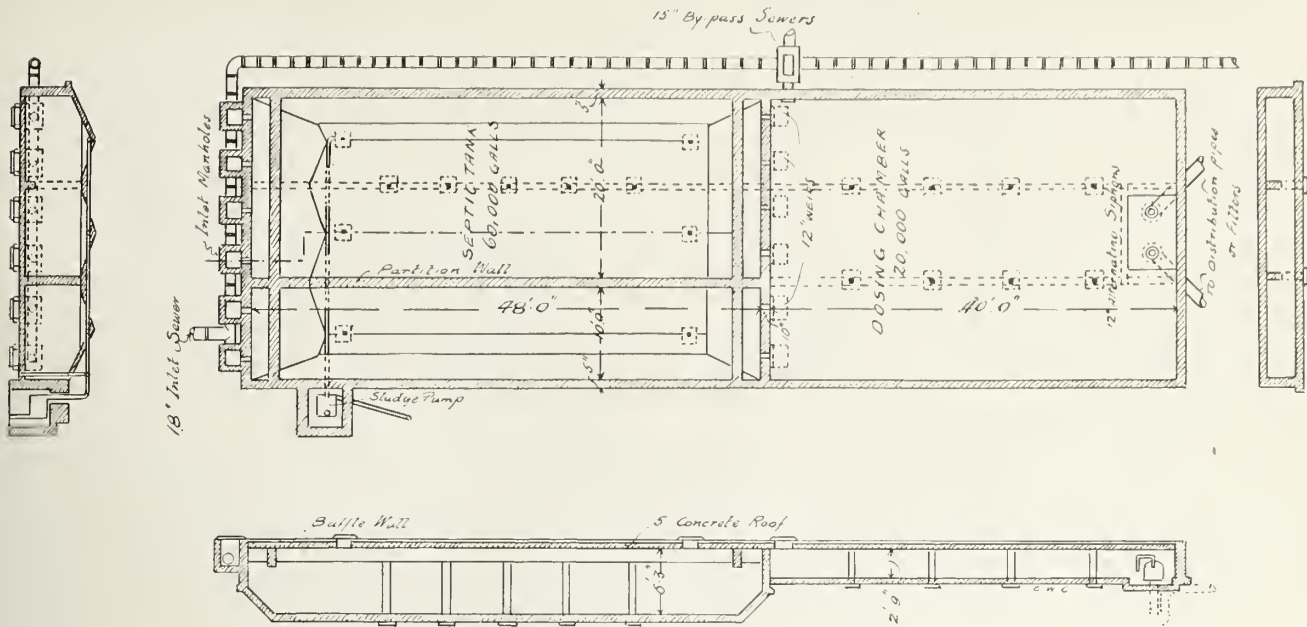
Plan and Sectional Elevation of Septic Tank.
